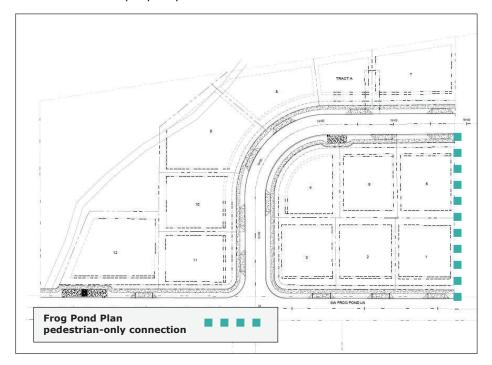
MASTER PLAN PEDESTRIAN CONNECTION
